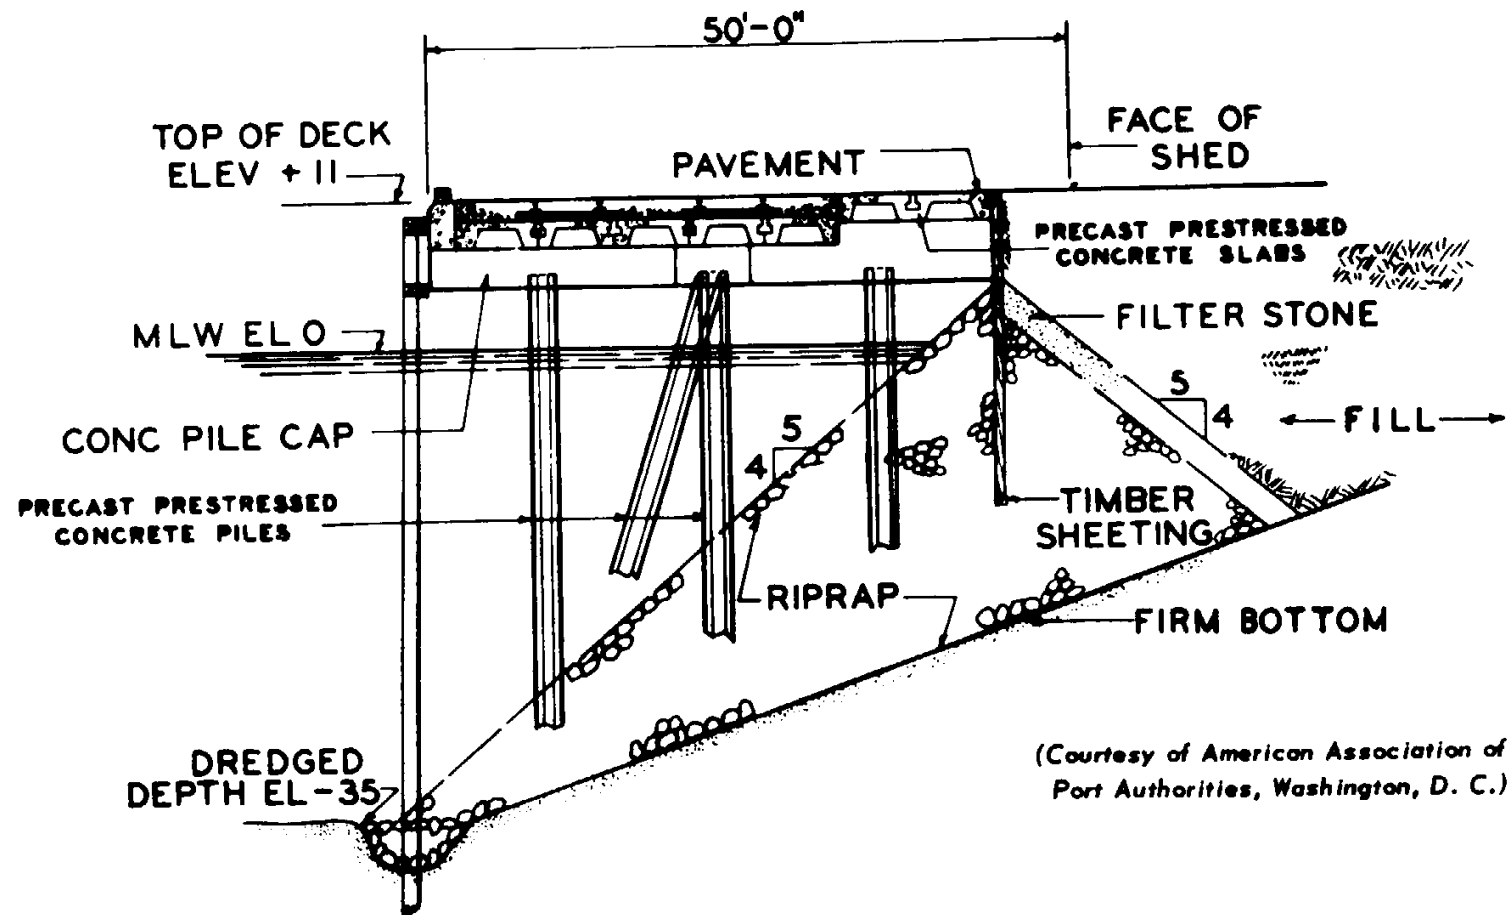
High-Level Open-Type Wharf Construction with Precast Concrete Deck on Concrete Piles.
